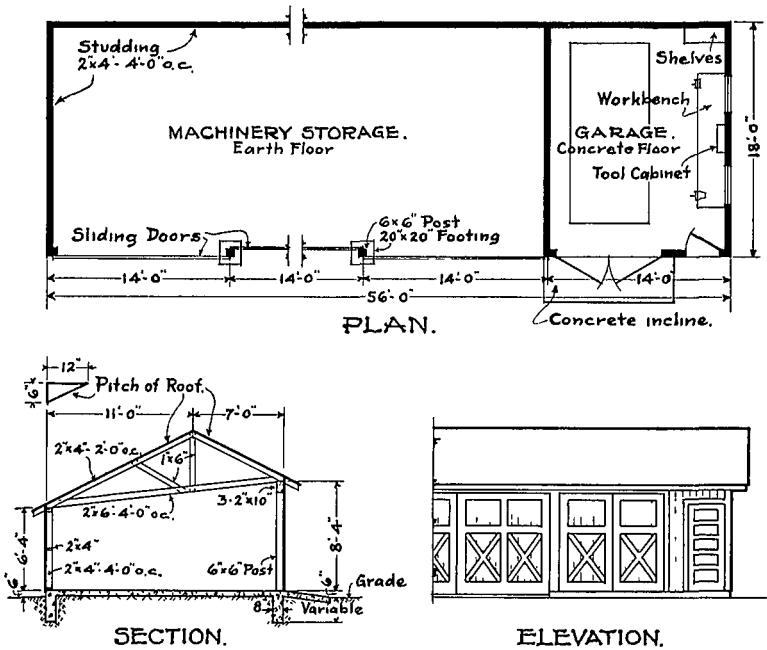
MACHINE SHED 18X56 FEET, PLAN 253
